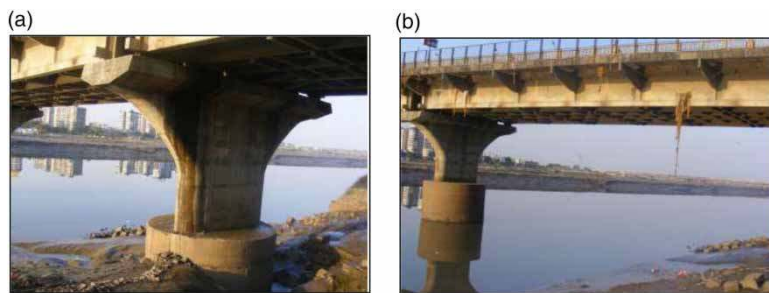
| (a) Study area showing bridge piers, (b) Sardar Bridge showing piers.
